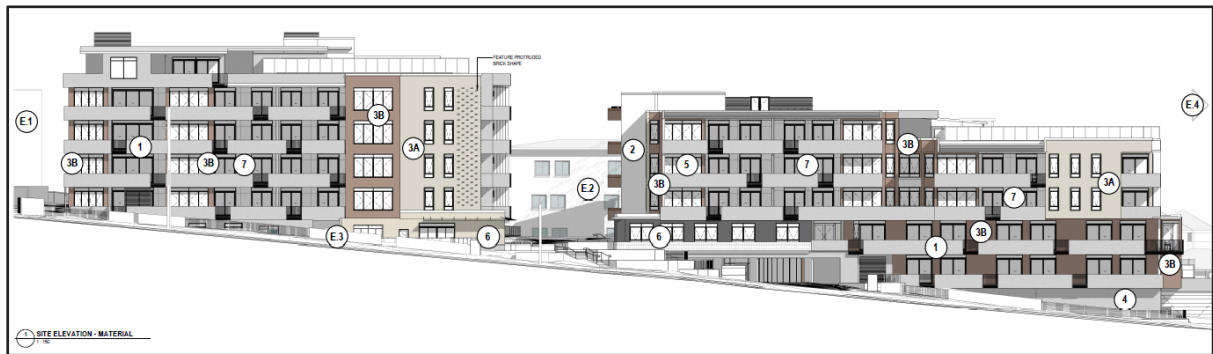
| Street Elevation (Source: Applicant's Plans issued July 2023)
